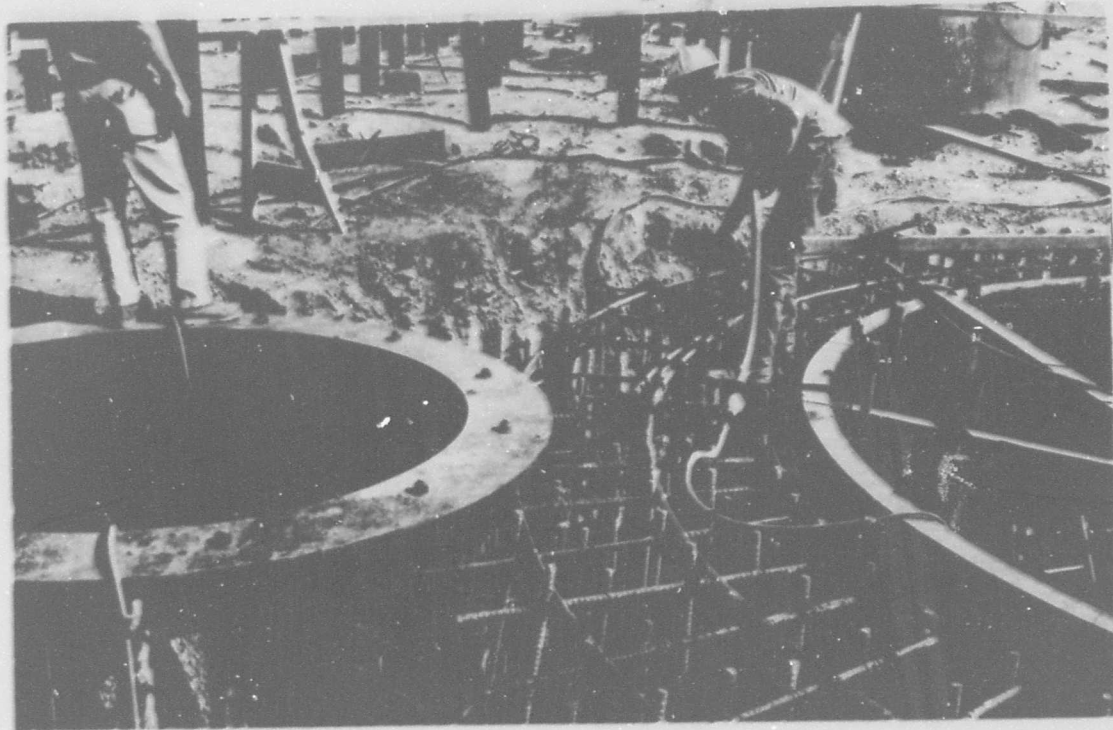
Vibrating Concrete for Full Scale Closure and Access Shaft.
